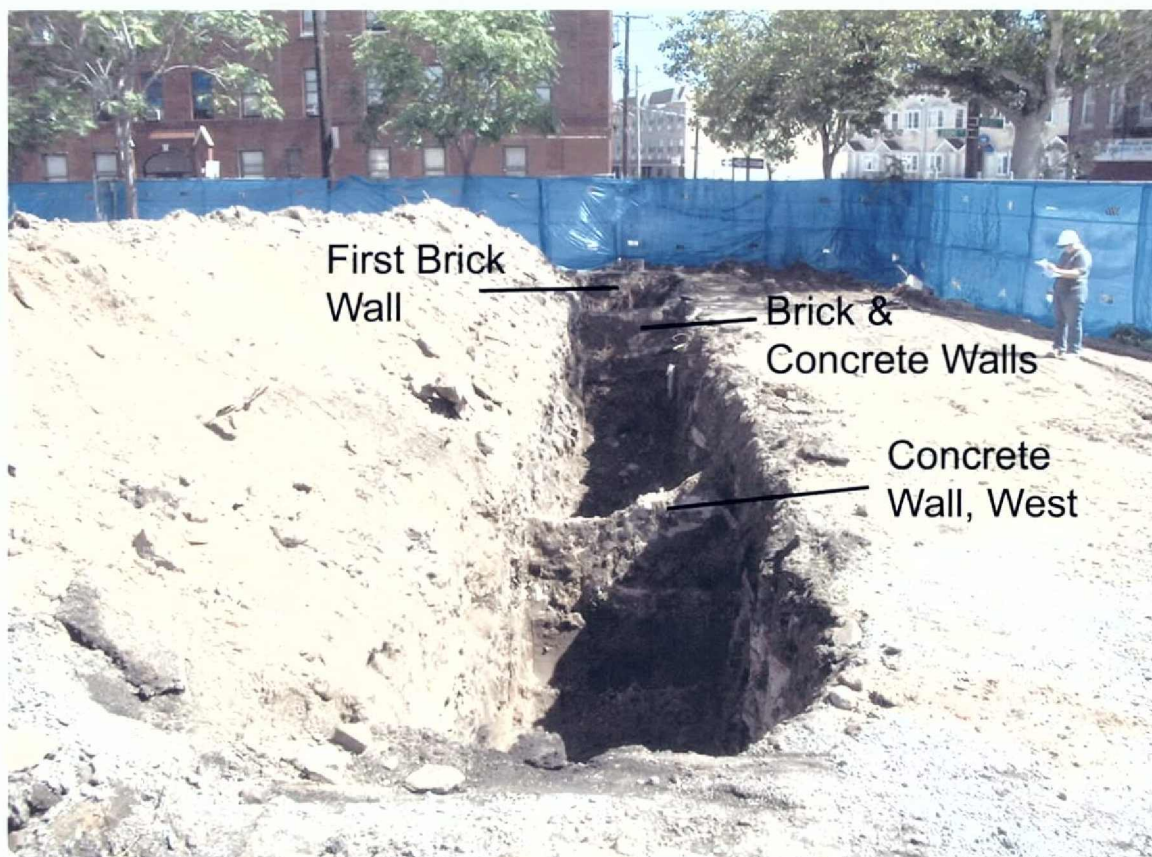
View of Backhoe Trench 4002, facing east, illustrating western concrete wall, brick and concrete walls, and eastern brick wall.
